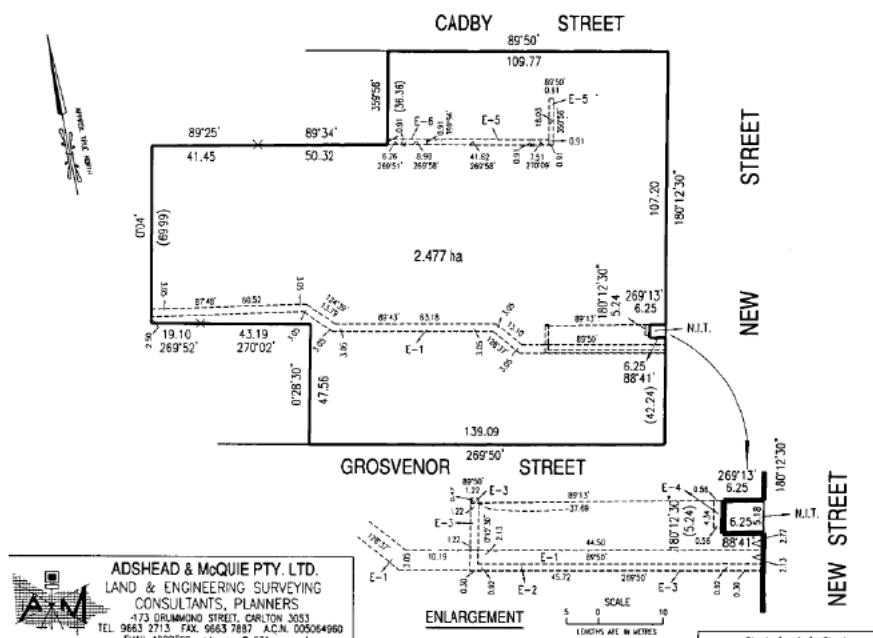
Plan of Subdivision - 80 Outer Crescent, Brighton
